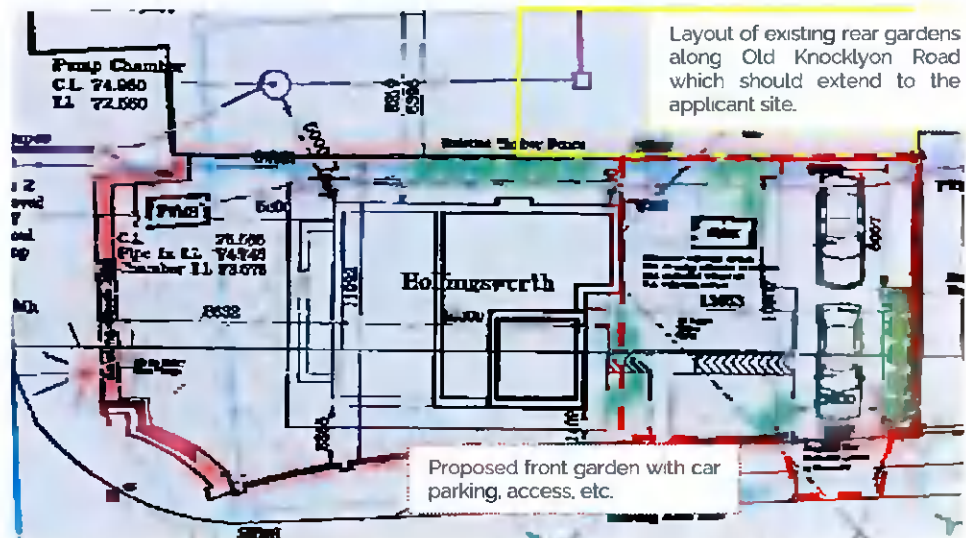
Applicant's Proposed Site Layout Plan sites the front garden adjoining client's rear garden, etc.
